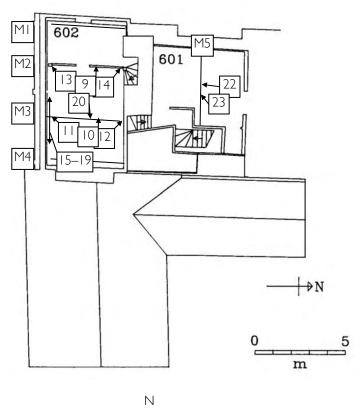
Plan of Level 6 of Bessie Surtees House showing the location of rooms 601, and 602, the truss numbering scheme assigned to the Milbank House roof trusses MI—M5, and the approximate location and direction of samples 9–20, and 22–23. Based on Figure 9 of Heslop et al (1994)
